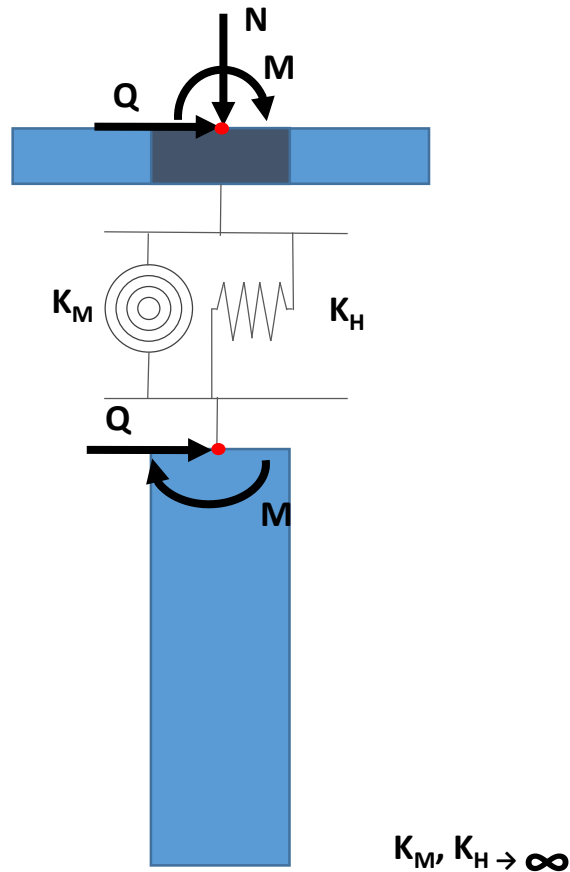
2-D sketch of the connection between the footing and the pile, allowing relative vertical translation of the two components, while horizontal loads and moments are carried by the hybrid foundation.
